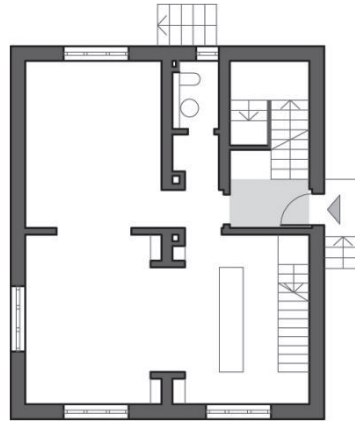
Inner hall, the entry-lock zone. Ground floor plan, private house, Bochum, Germany, © [DETAIL]. Reproduced by permission of DETAIL. Figure: Fernanda Acre.
